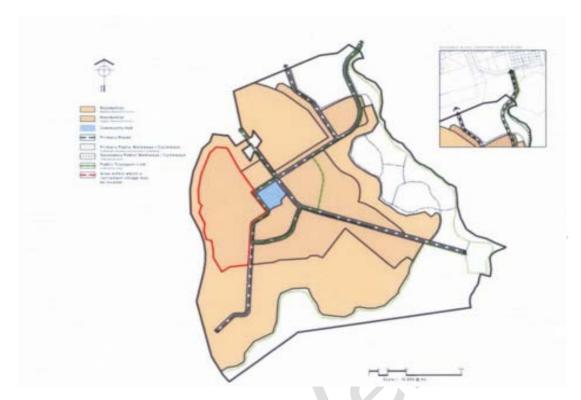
Plan 2 Lakeside Precinct Plan: Public Transport, Primary Road Network and Walkways/cycleways (previously referred to as Lakeside Precinct Plan 16.5.1(3)(b))
